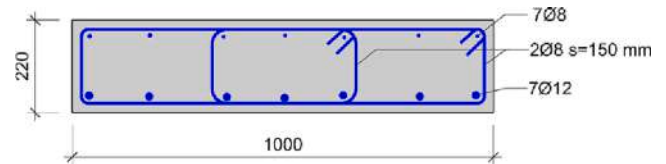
Slab cross-section and details of the internal steel reinforcement, concrete cover: 25 mm (all dimensions in mm).
